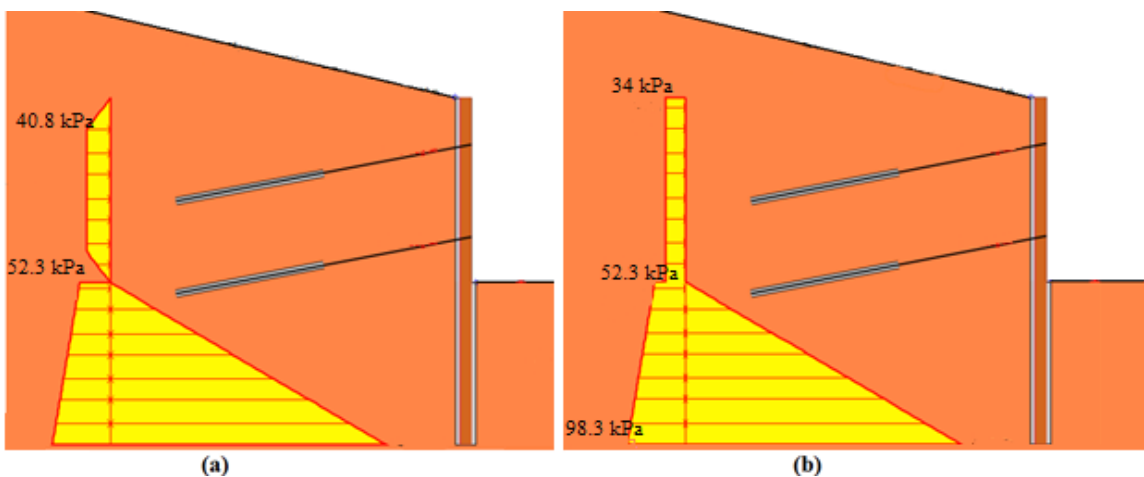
Lower Wall Model: (a) FHWA envelope. (b) Peck envelope
